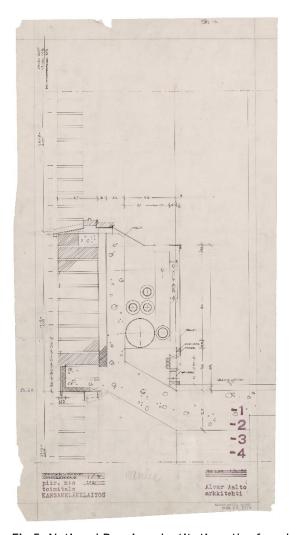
National Pensions Institution, the façade structure is cantilevered and floor slabs climb as projections toward the facade. Drawing AAM.
